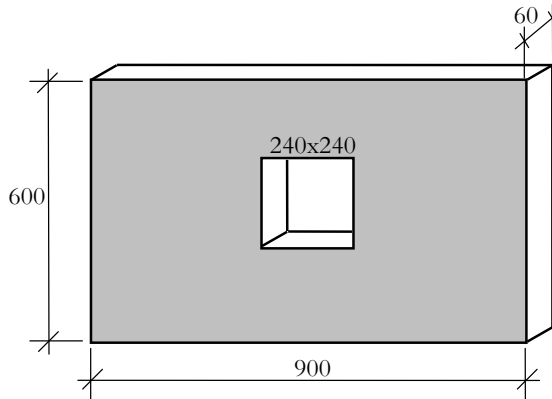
Geometrical characteristics of the wall with opening in mm
